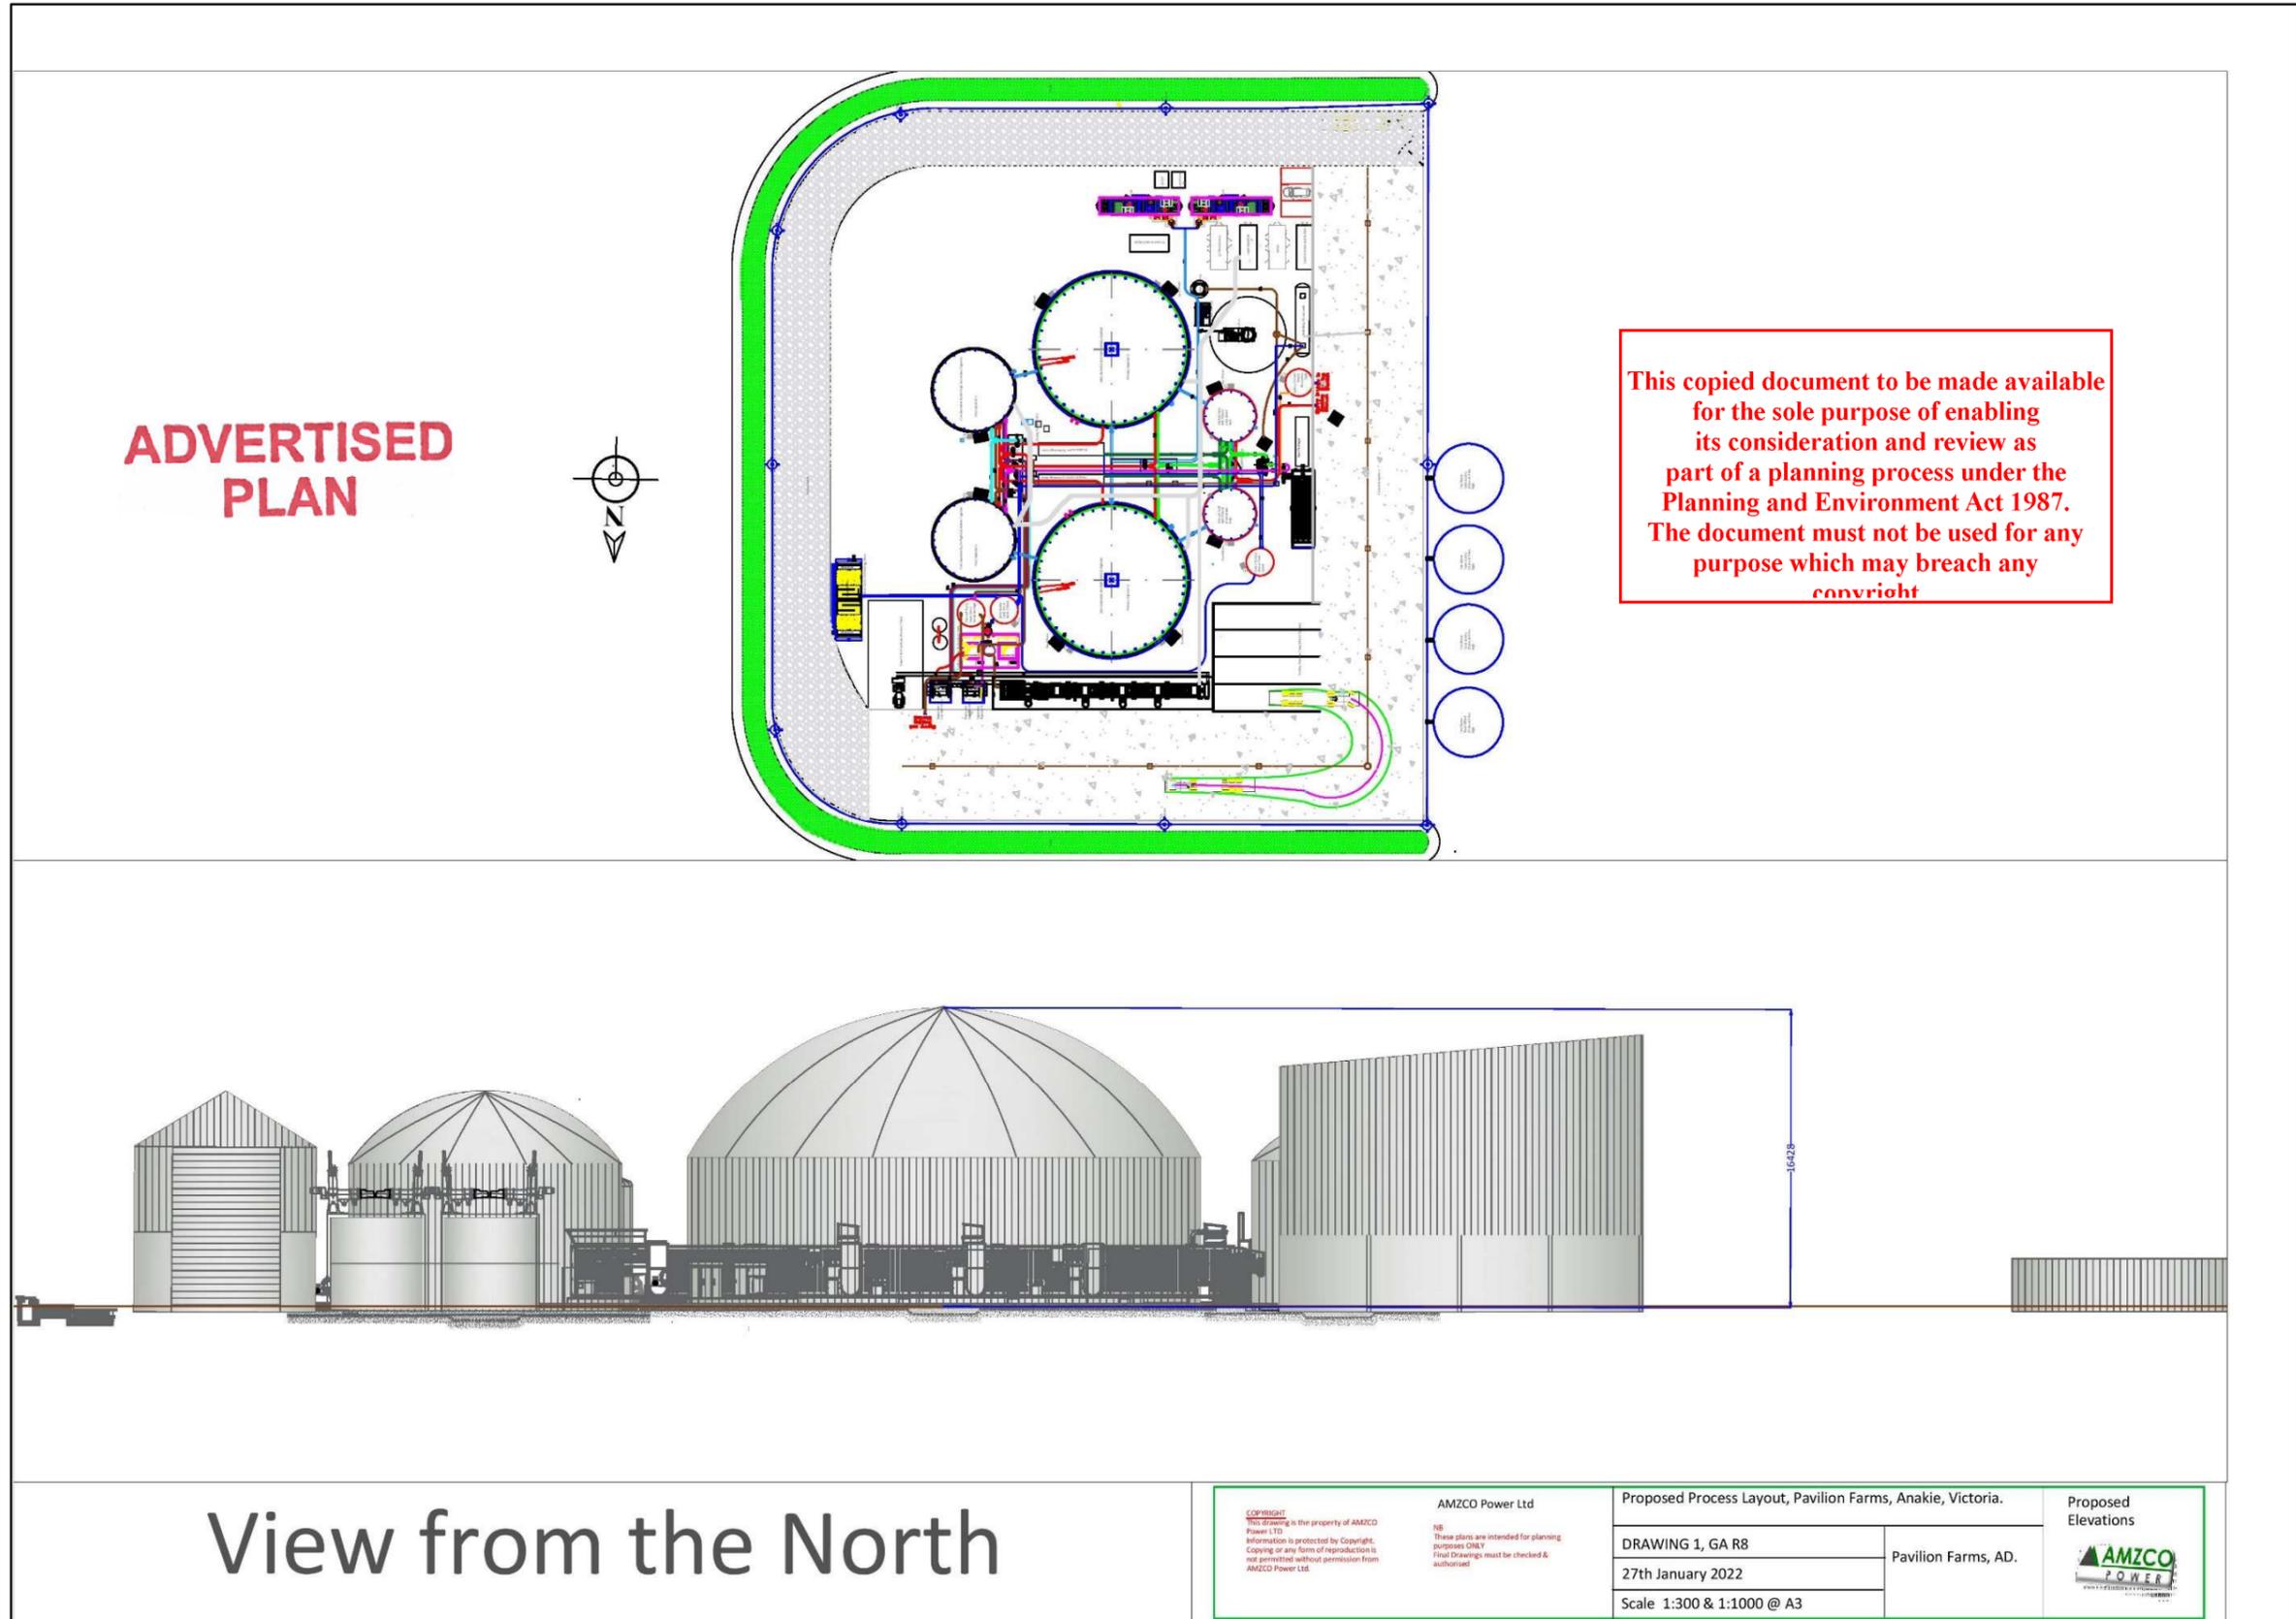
Site layout and elevation: Northern perspective of the Proposed Fertiliser Facility
